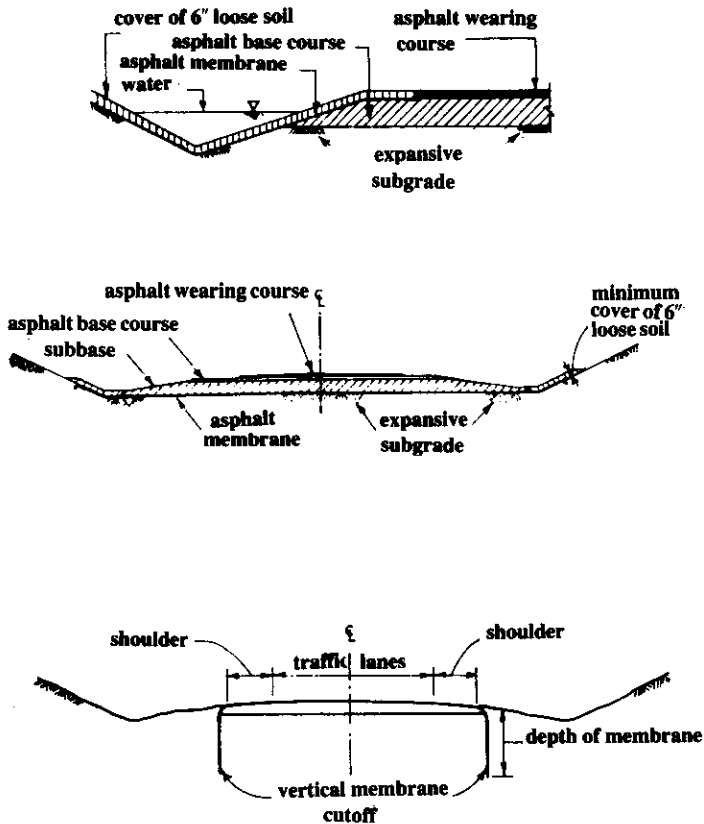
Typical examples of membrane application in highway construction (after Snethen, 1979)
